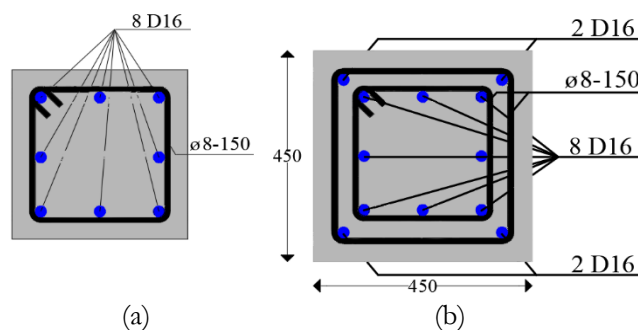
Comparison of reinforced concrete for the column before and after retrofitting.
